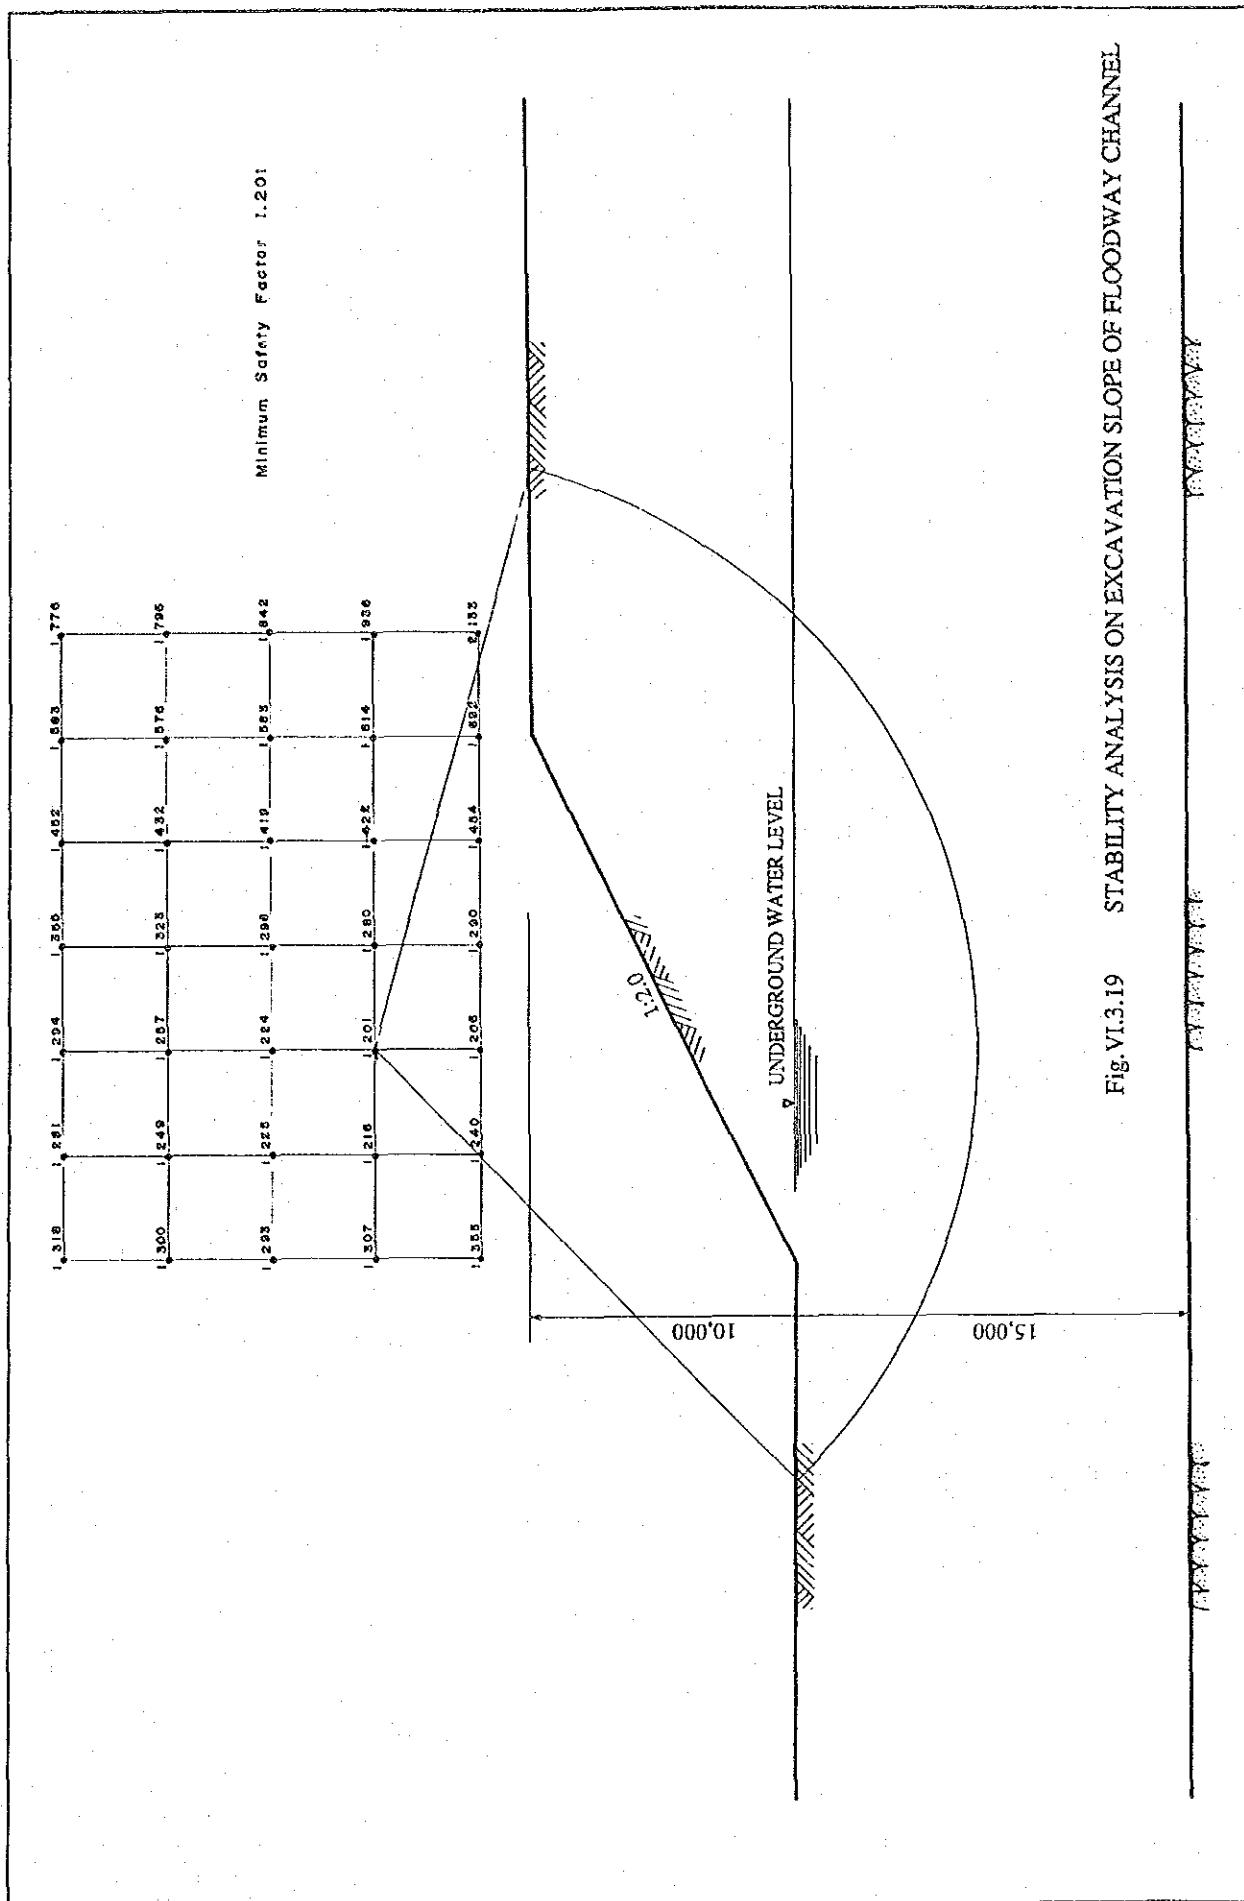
STABILITY ANALYSIS ON EXCAVATION SLOPE OF FLOODWAY CHANNEL
